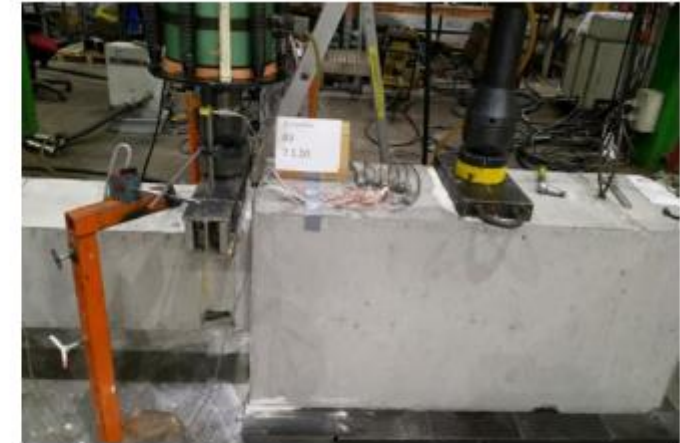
PHOTO FROM THE TEST SETUP, BEFORE LOADING THE CONNECTION
